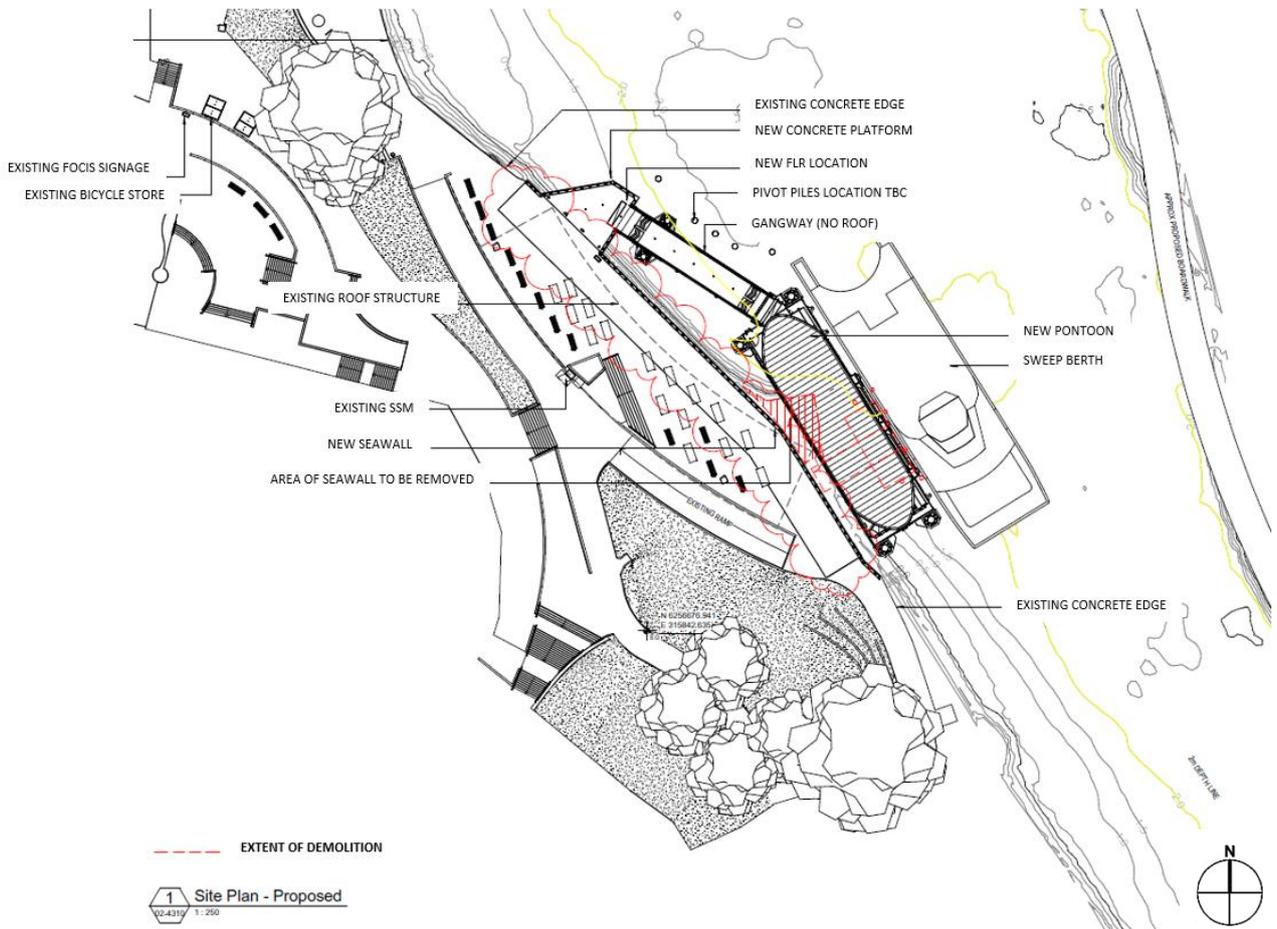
Plan of proposed works at Parramatta Wharf. Proposed demolitions are indicated in red. (Source: Proposed Site Plan, Drawing no. AR-02-1000)
